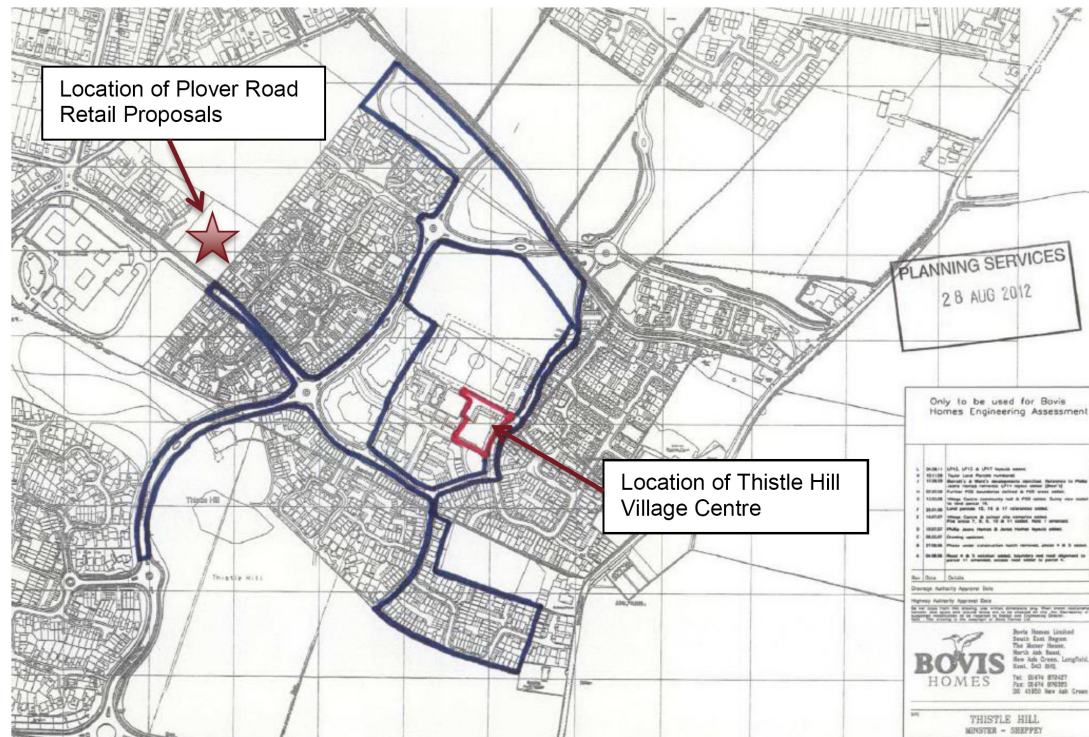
; Location of Thistle Hill village centre and Plover Road (extracted from retail Planning Statement)
